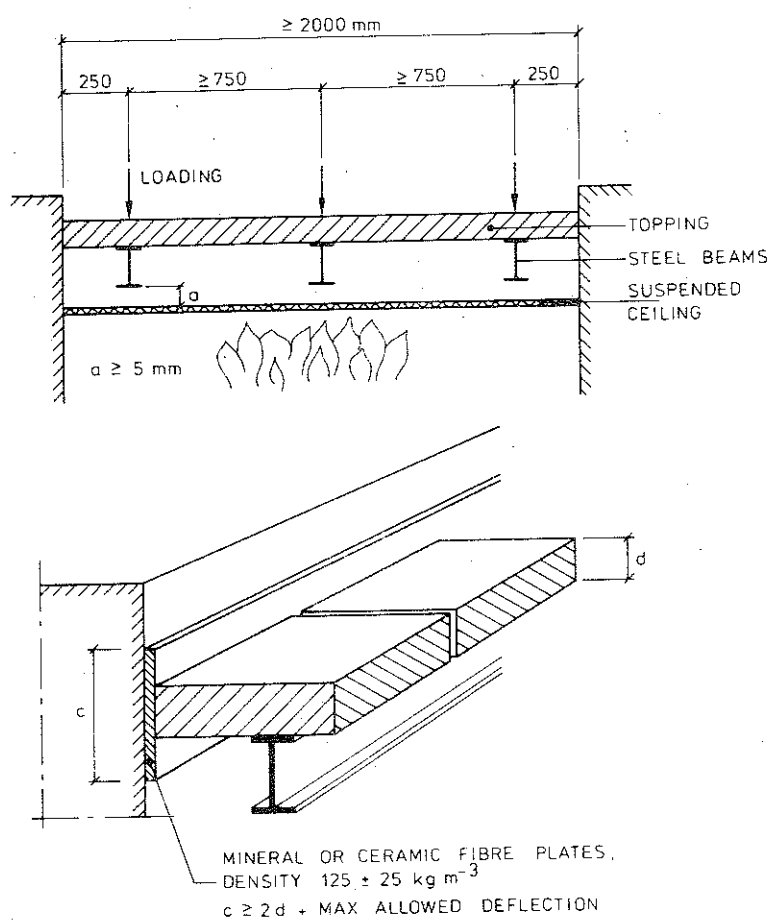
Test specimen according to a proposed ISO standard for a determination of the contribution of a suspended ceiling to the fire resistance of an unventilated floor or roof assembly with load-bearing steel beams [3]
